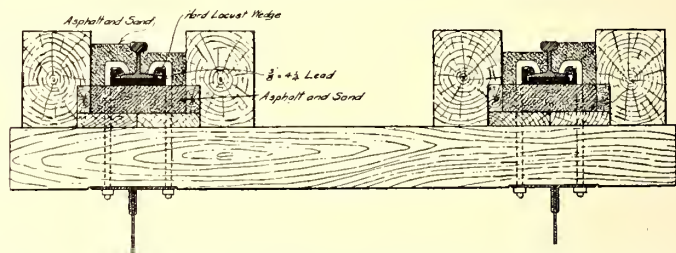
MANHATTAN RAILWAY EXPERIMENT, SHOWING SAME AS FIG. 1, EXCEPT THAT STEEL CHANNELS REST UPON ASPHALT
